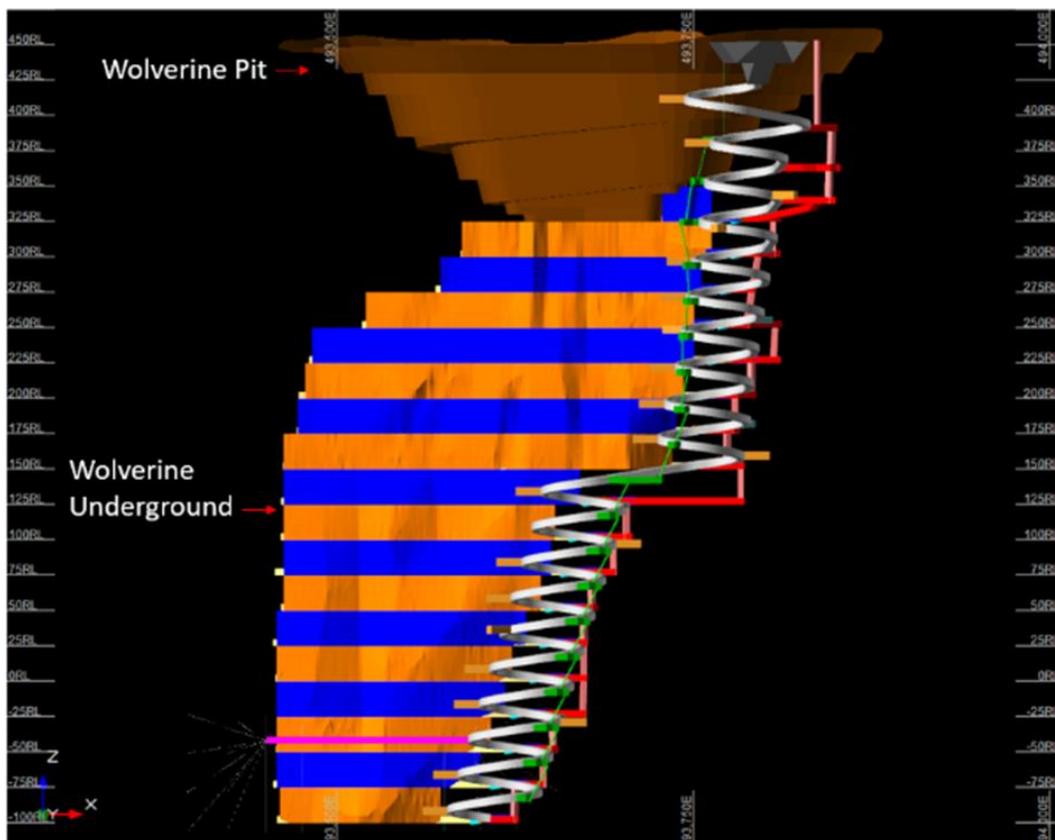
Proposed Wolverine Open Pit and Underground Design (Looking North)
